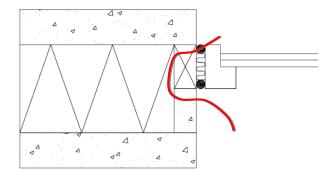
detail window sill mounted in the prefabricated wall element (ill. Rambøll Norge AS) The red line indicates a possible leakage through the wall. This sill is part of the precast concrete element.
